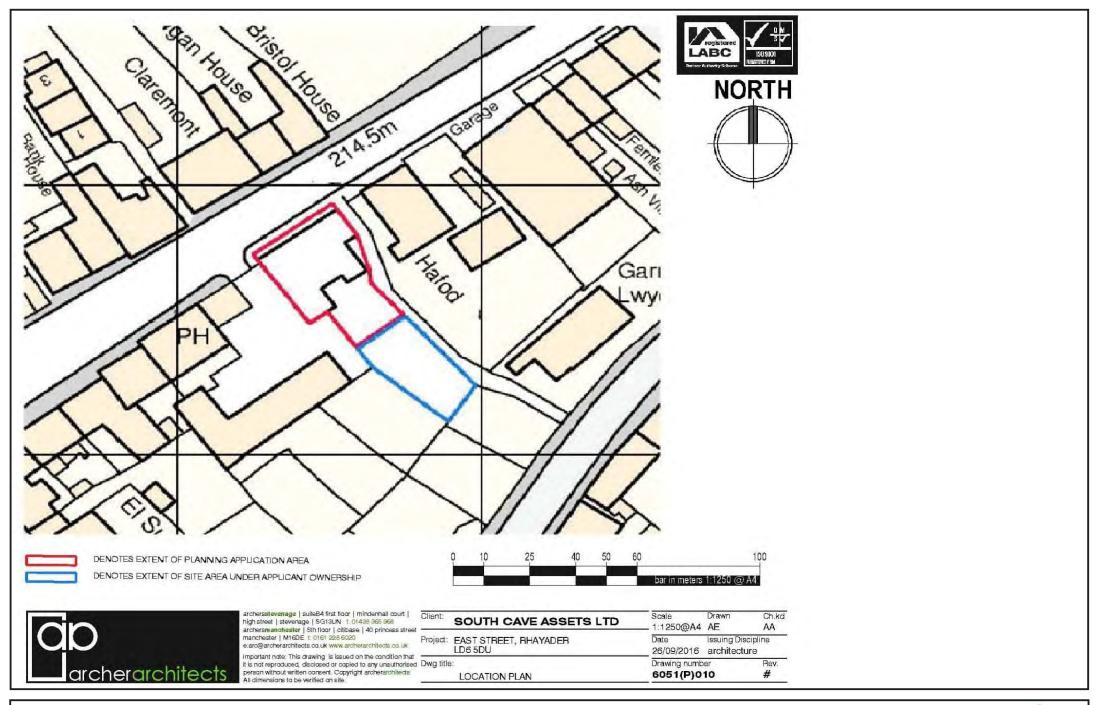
Location plan of site and site outline (red) within Rhayader (from Archer Architects source); scale: 1:1,250
